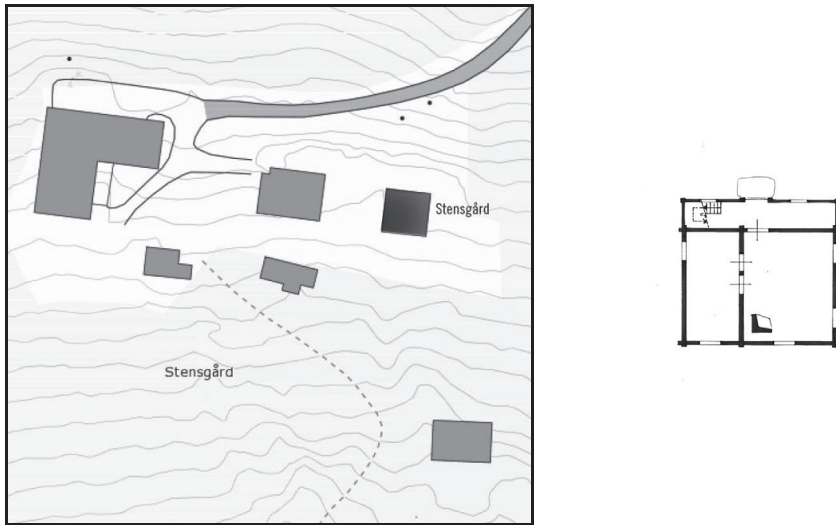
Stensgård site plan (left) and floor plan (right), (August Schmidt 2010)
